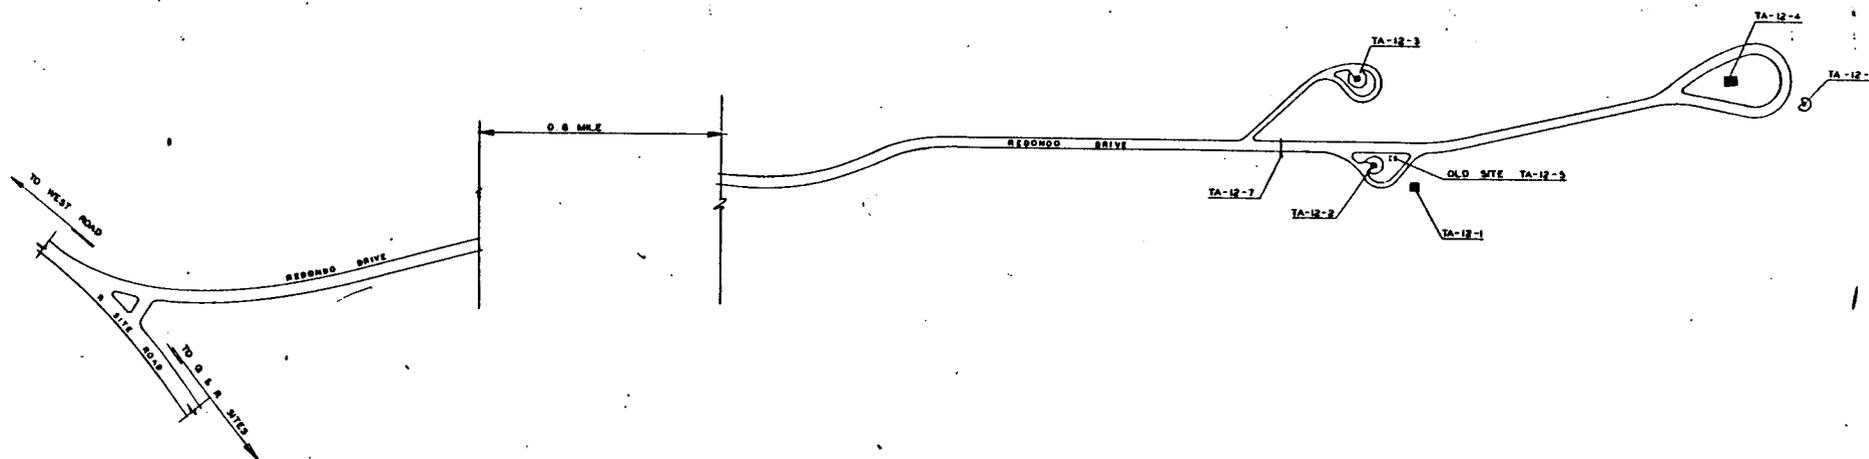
Structure Location Plan for TA-12 - L Site (1950)
